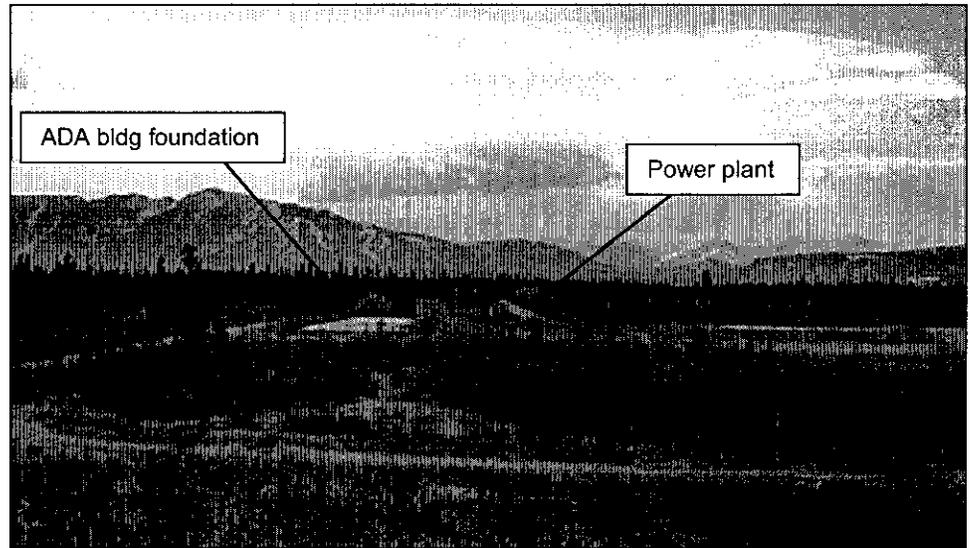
ADA foundation and power plant. View looking south from Receiver 2 mound.
